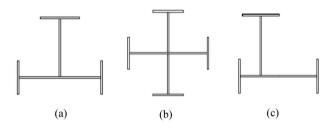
Steel special-shaped columns with thin-walled open section 图 1. 开口截面钢异形柱
